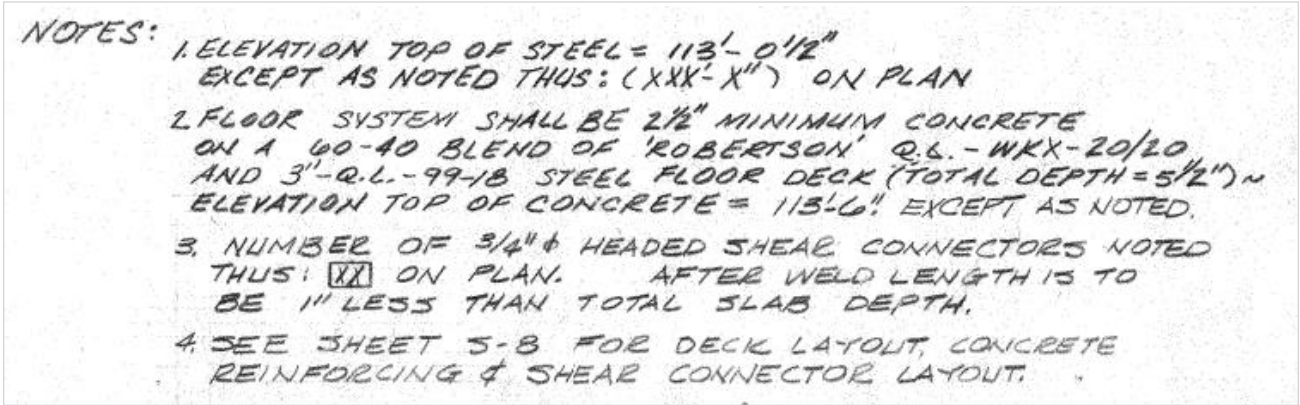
Original structural drawing note for 2-1/2” concrete slab on 3” steel deck (5-1/2” total thickness).
